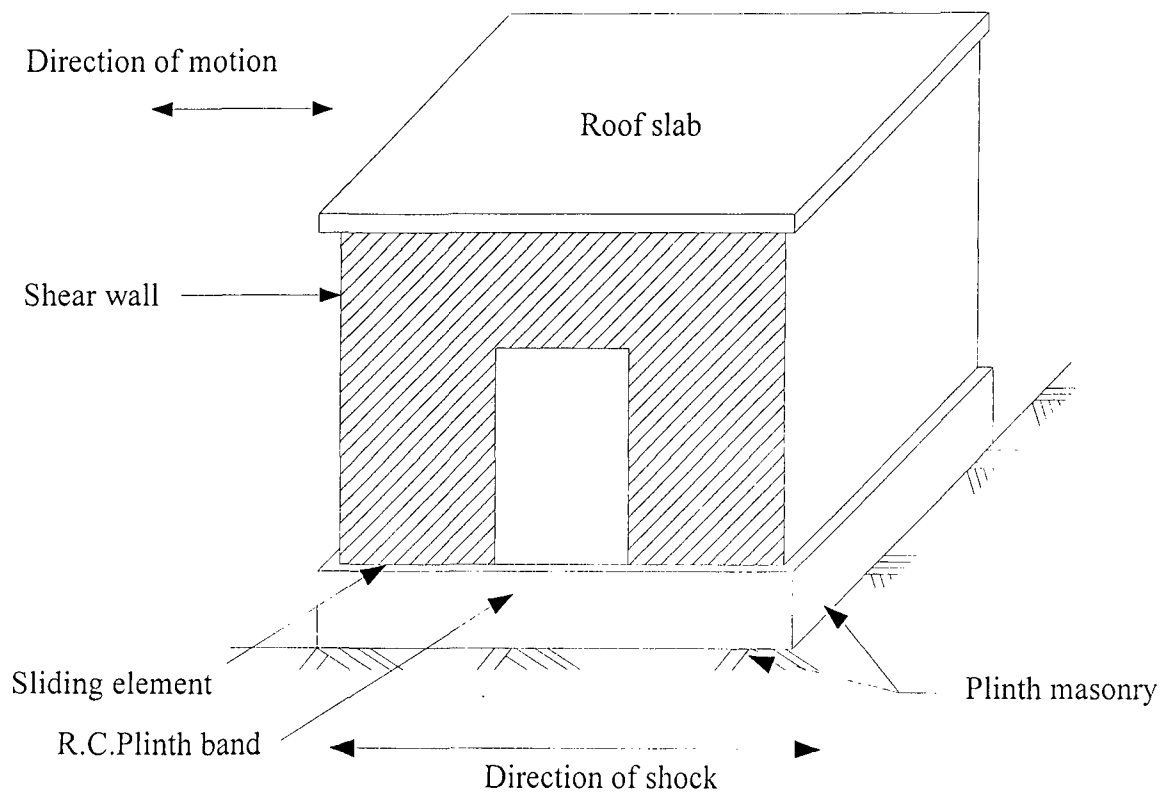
Idealized Sliding Type Single Storey Structure
